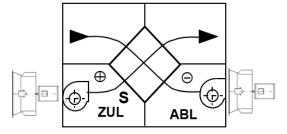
supply air pressing, exhaust air sucking; 1 pressure switch (S), 2 measuring points (+/-)
